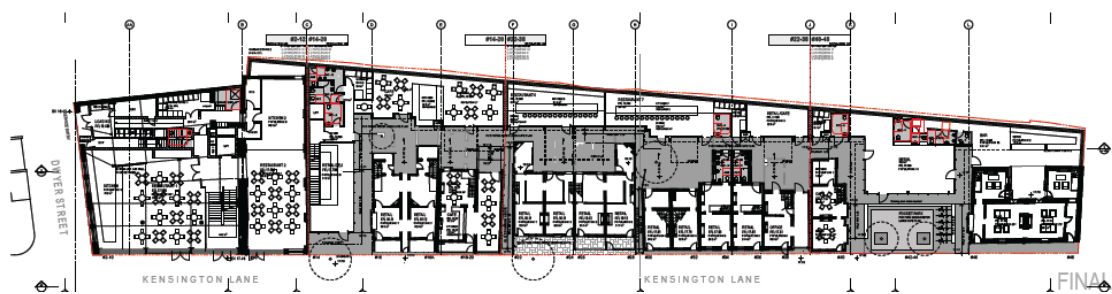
Block 6+7 proposed site plan showing new build to the rear of the terraces and pedestrian laneway between existing terraces and new build retail (shaded grey).
